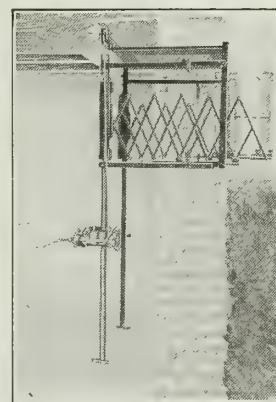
Flexible Platform Extended Through Wall to Sidewalk. Handles all sizes of ash cans
